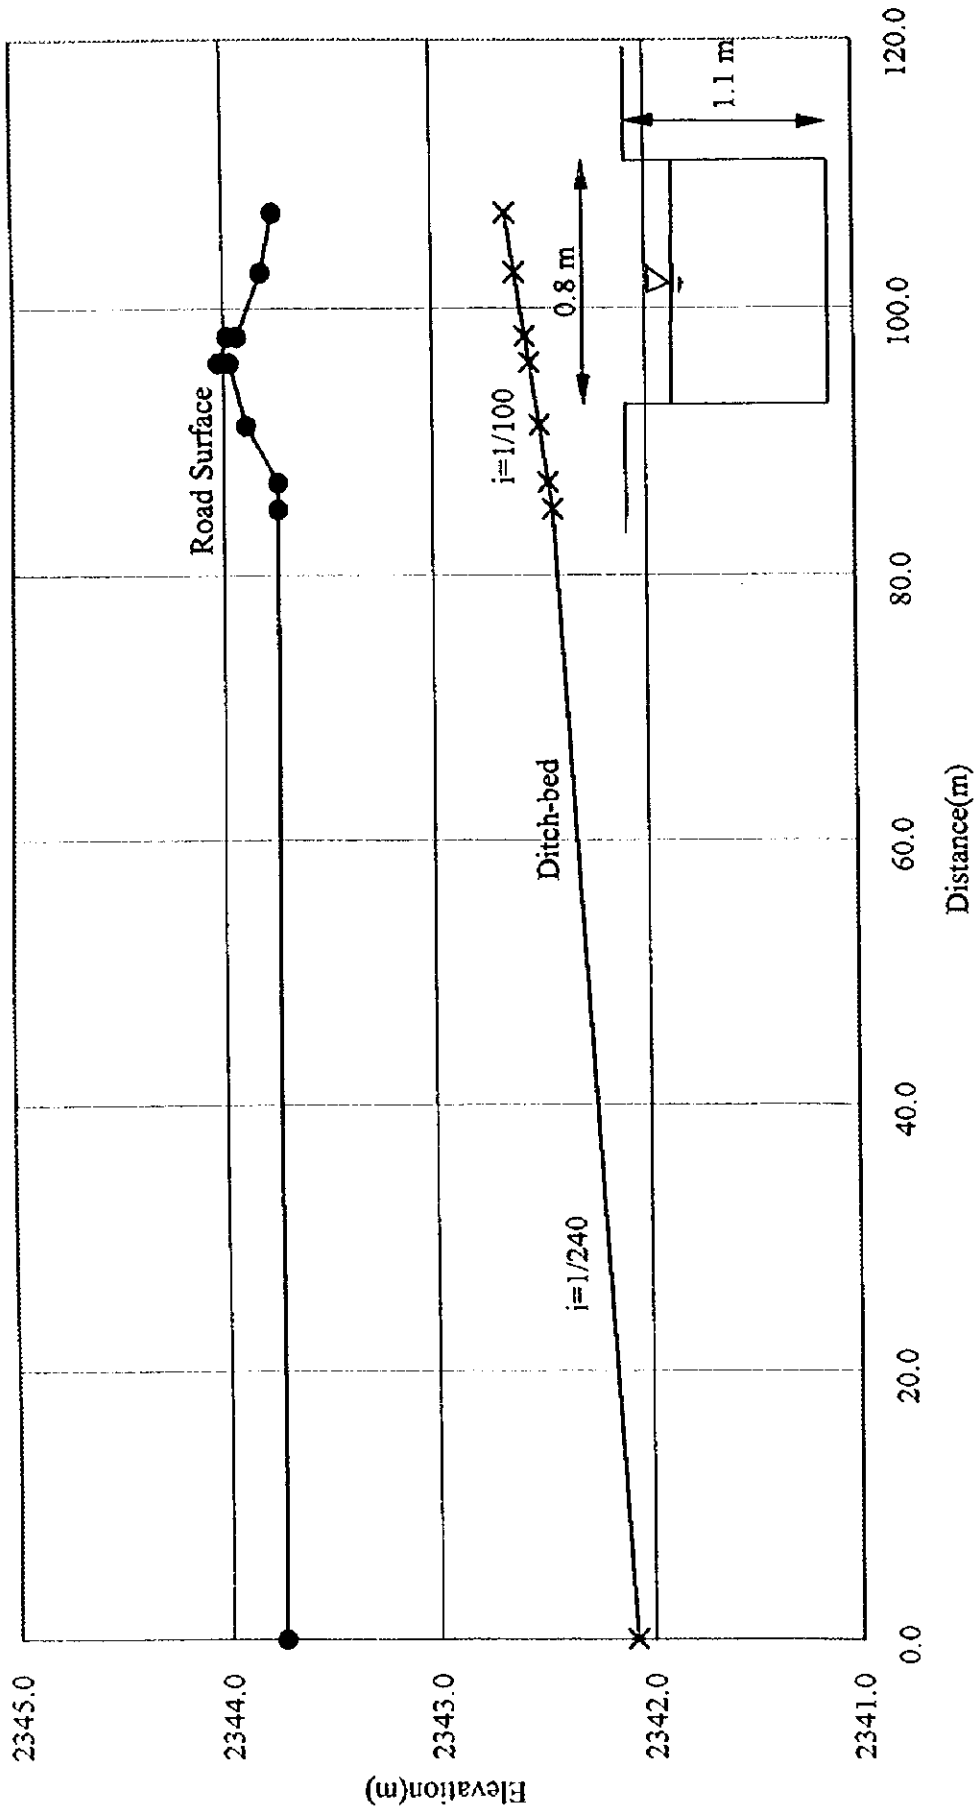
Longitudinal and Cross-sectional Profiles of Drainage Ditch for WS-1 Basin
